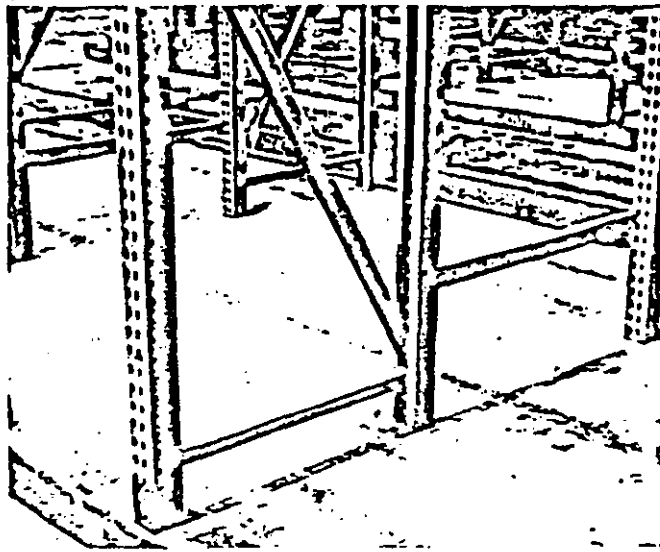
Loaded legs supporting high-rack storage must have base plates of adequate size to prevent bearing or shear failure in the slab.
